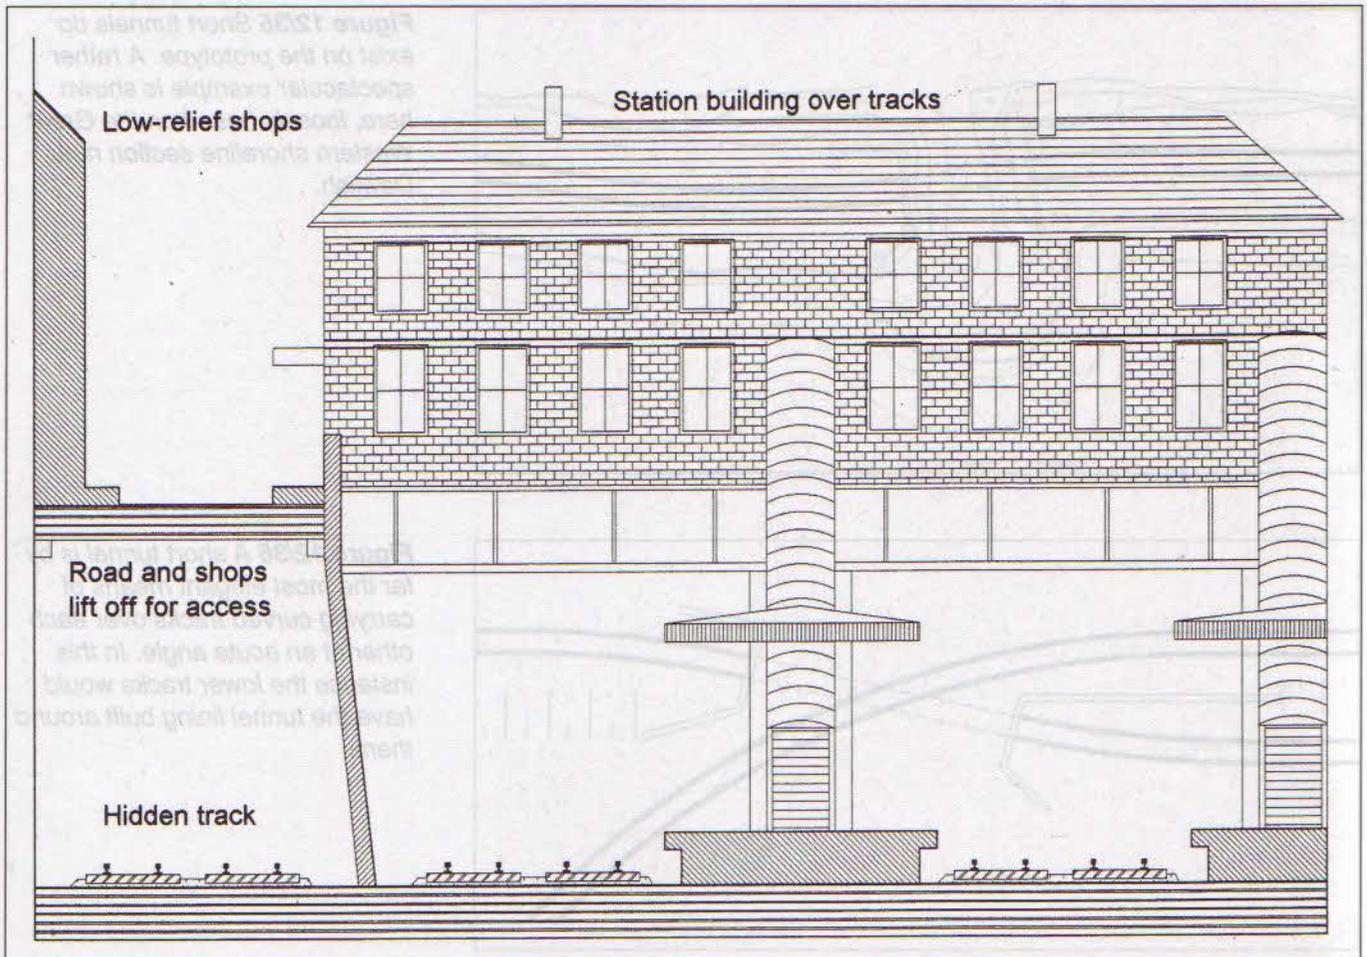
/33 Occasionally, where width is limited on the prototype, station buildings are built over the tracks. Custom House and Canning Town stations on the GER line to North Woolwich in East London are extreme cases, since one had to climb stairs to reach the booking office from the road at track level. The more usual situation is where the station is in a cutting. In this example I show a road at high level, with low relief shops, covering hidden tracks. Note the very substantial girders supporting the station building.
